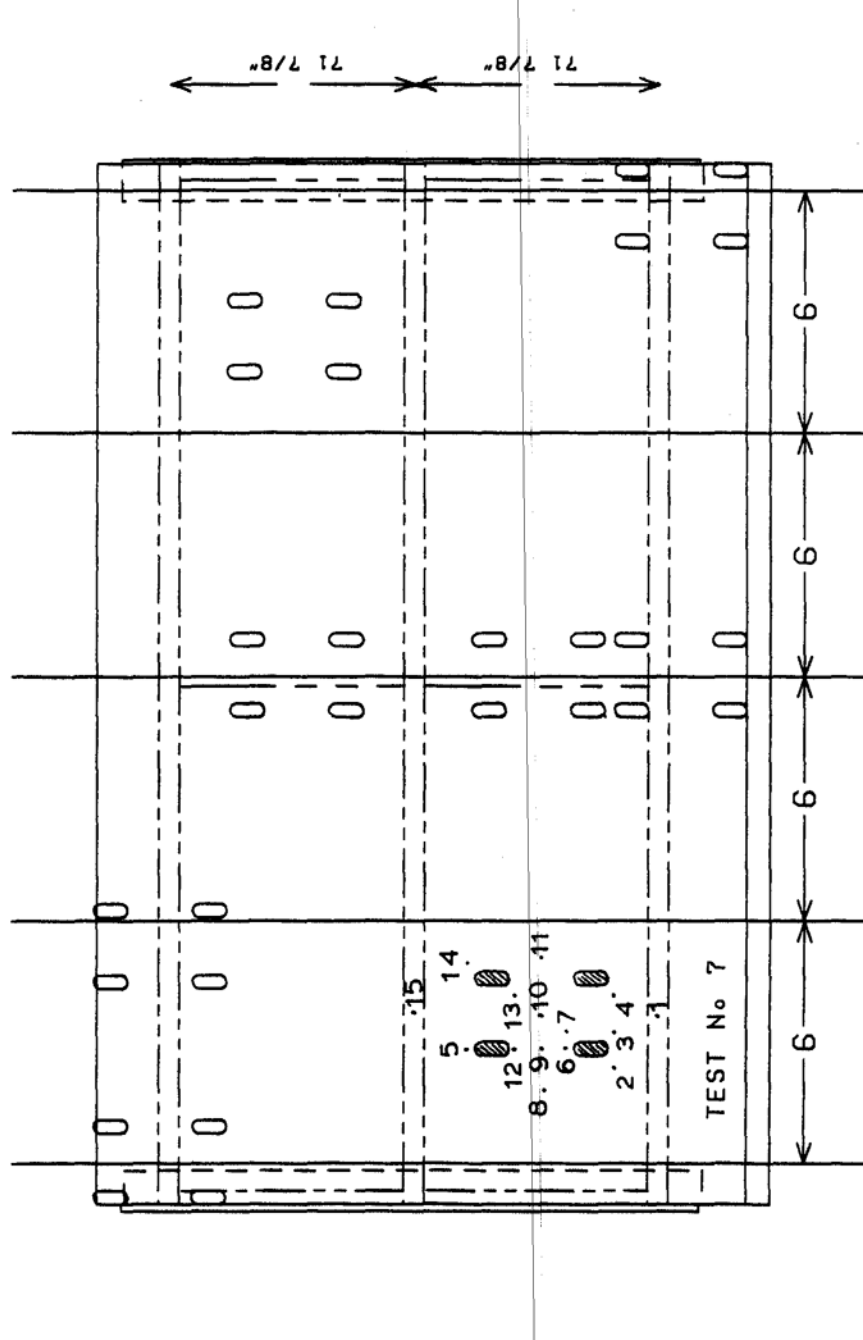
LVDT Locations (Third Bridge - Test No. 7)
